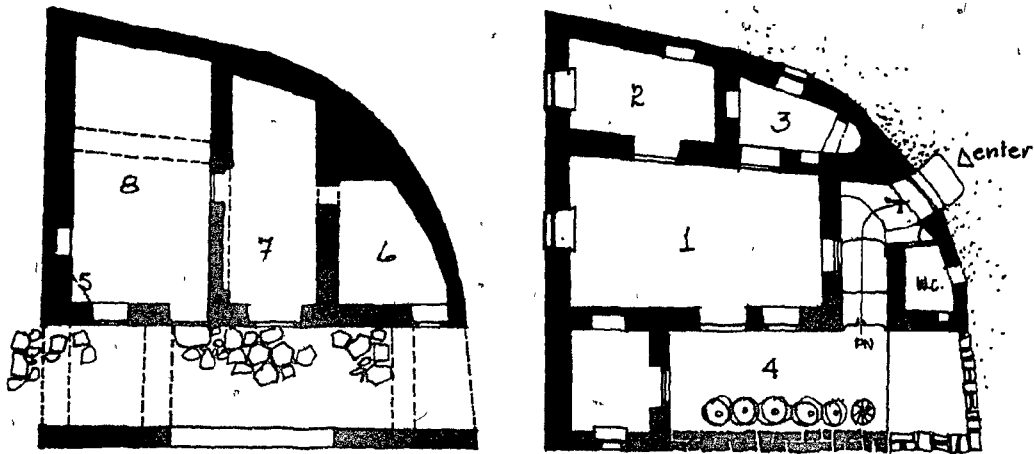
i. Amorgos. Two storey house built on a slope in Tholara.
